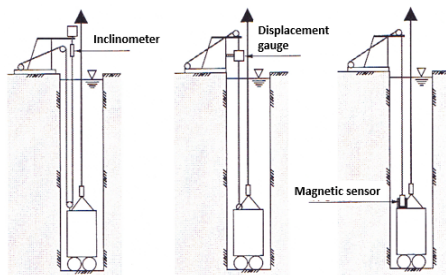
Control System for Vertical Accuracy of Diaphragm Wall
